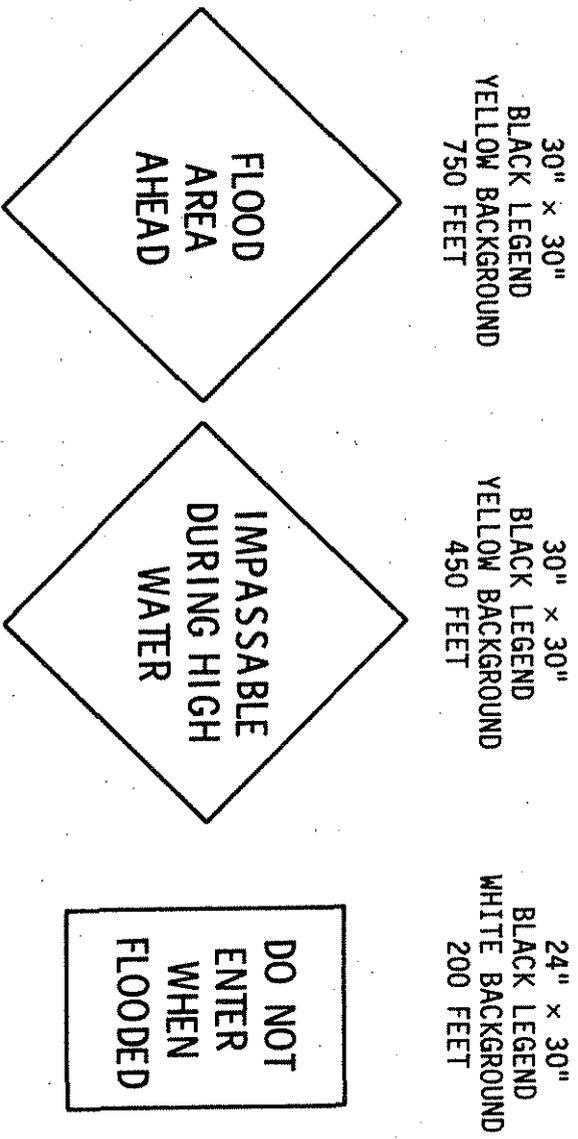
Signs recommended for installation at low water stream crossings.
